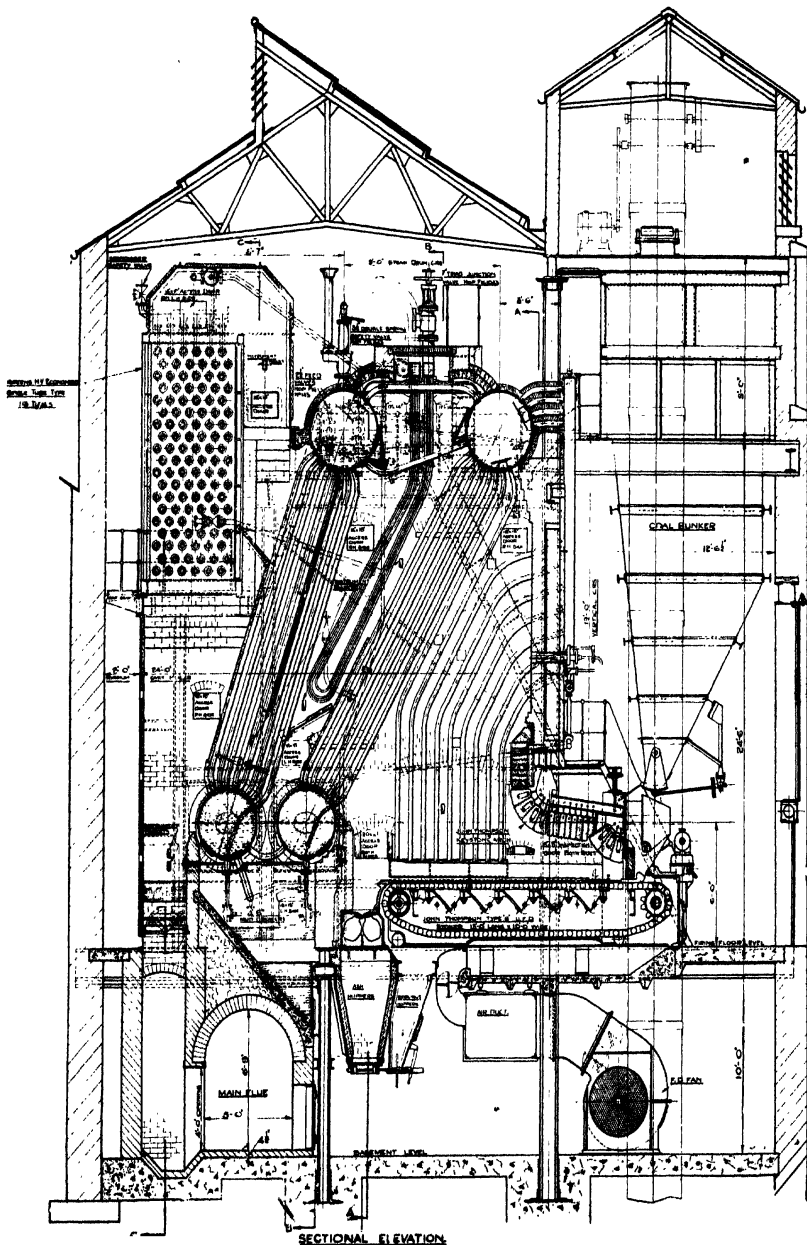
"BETA" TYPE WATER-TUBE BOILER
